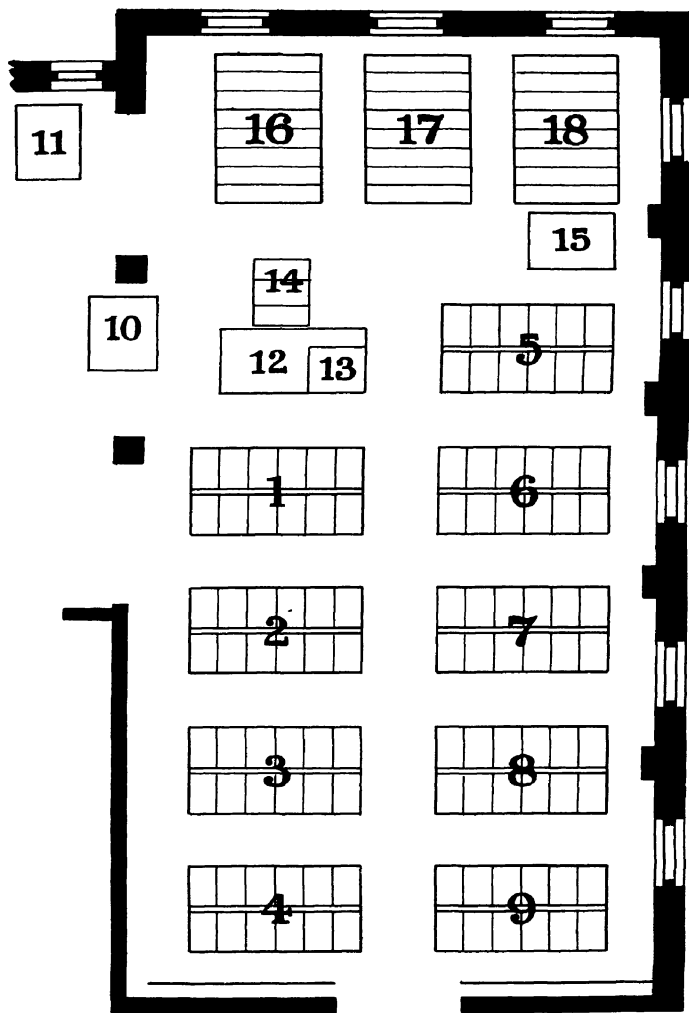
Floor plan of Picture Collection Dept. 24' x 50', at one end of Art Room. See Working Plan of Room.
